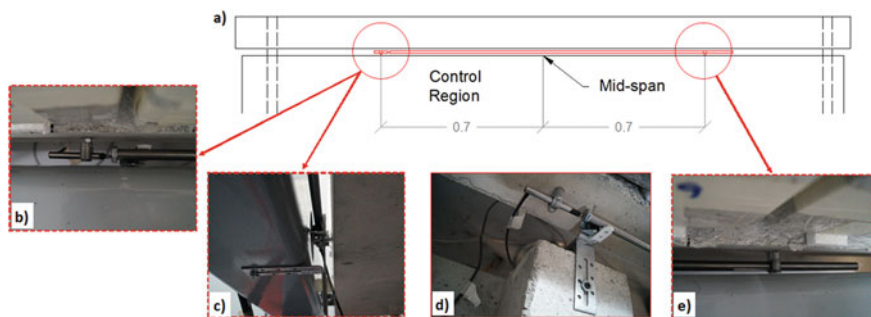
Longitudinal strains measurement system (final version): a outline; b detail of LVDT; c detail of roller support; d setup for unrestrained specimen; e fixed extremity
